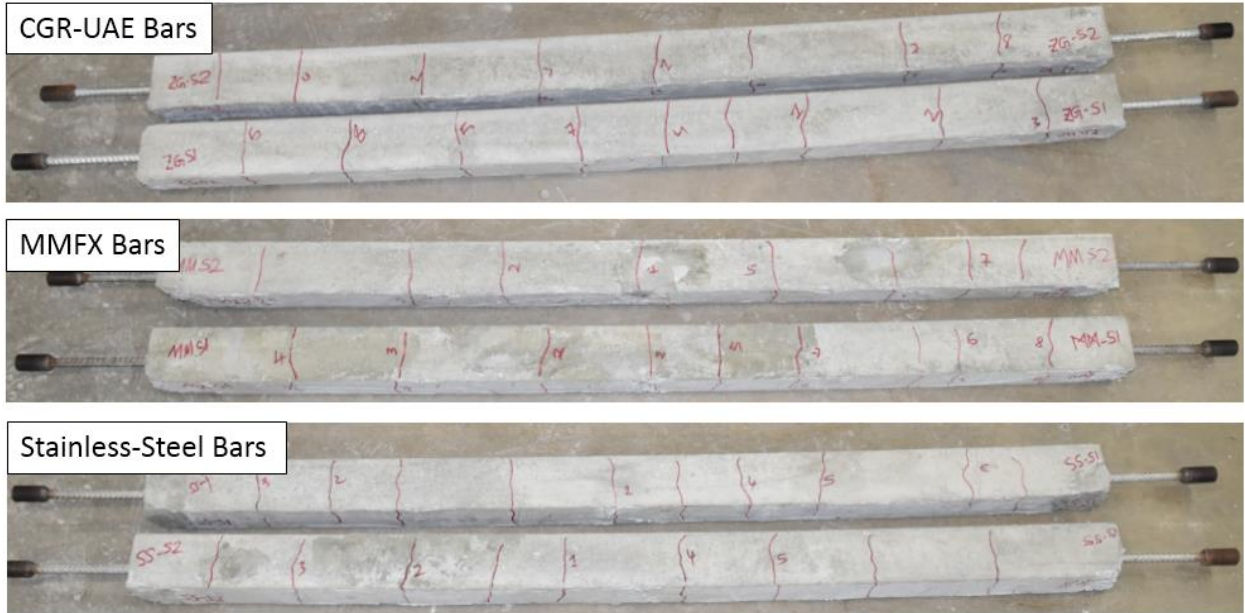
Cracks on Prism Specimens without Fibers with CGR-UAE Bars, MMFX and Stainless-Steel Bars
